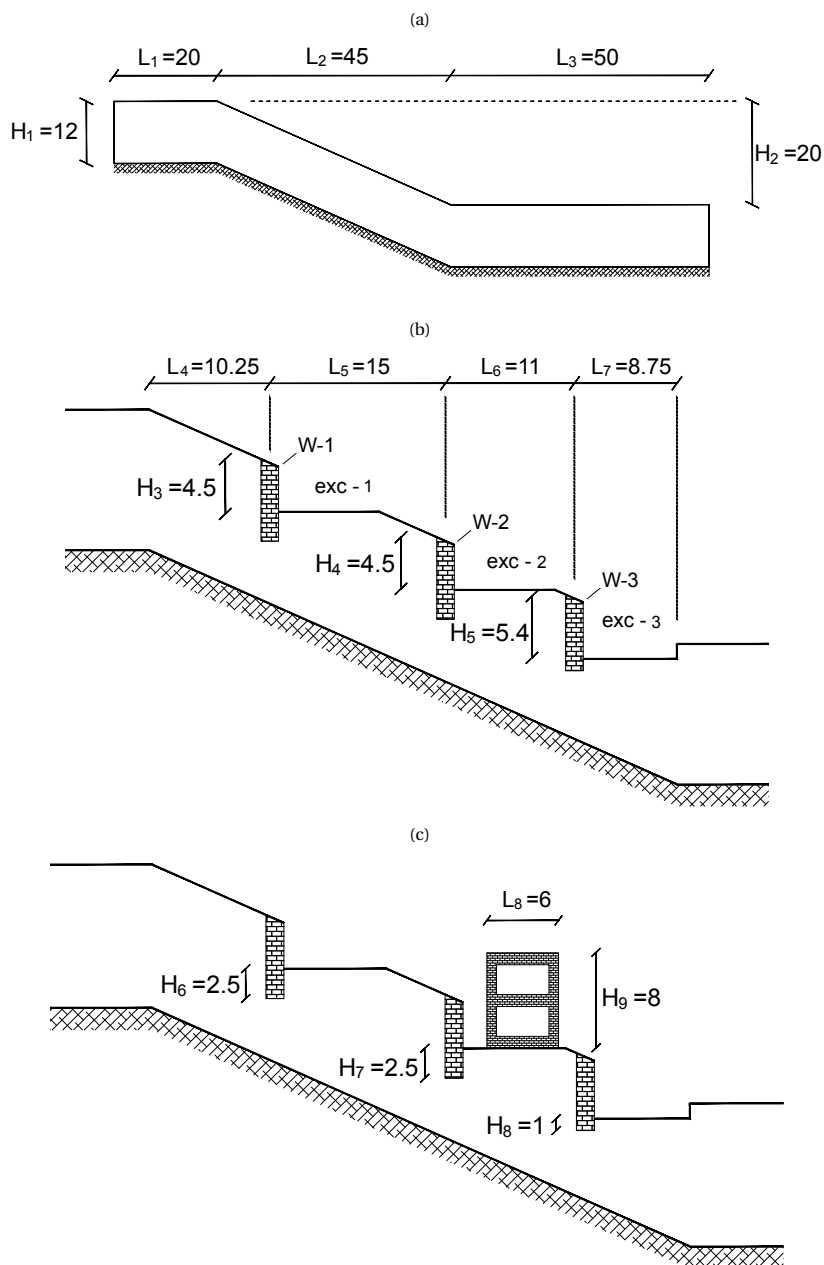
a) Slope dimensions, b) construction stages, and c) building and wall foundations. Note unequal scales to enable better visualisation; dimensions in meters
